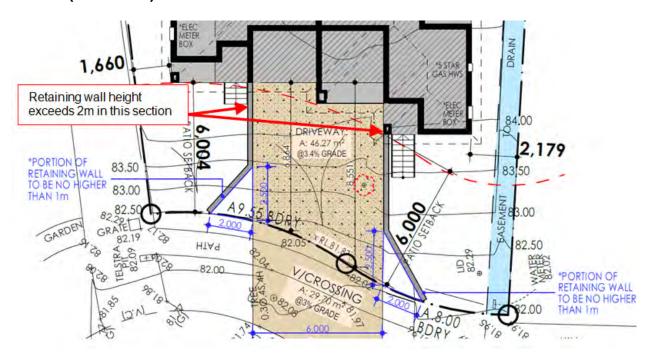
Extract from site plan showing extent of retaining walls in front setback.
